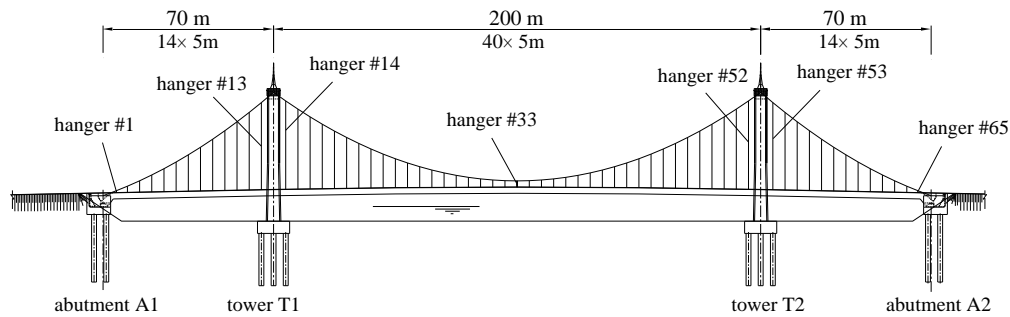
Layout of Zhuanghe Jianshe Bridge
